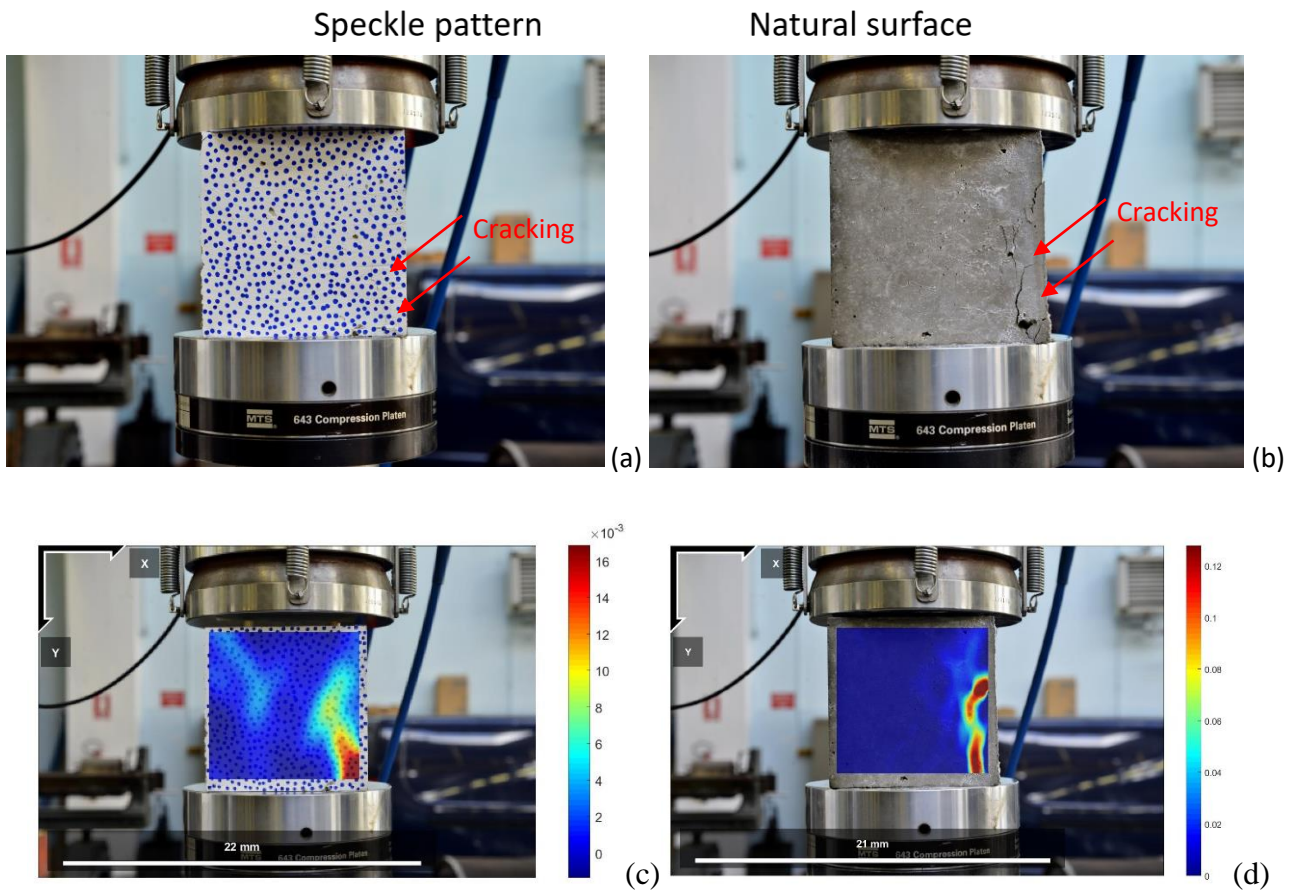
Examples of DIC analysis on concrete specimens: cracking on specimens with (a) and w/o (b) speckle pattern; normal horizontal deformations for specimens with (c) and w/o (d) speckle pattern.
